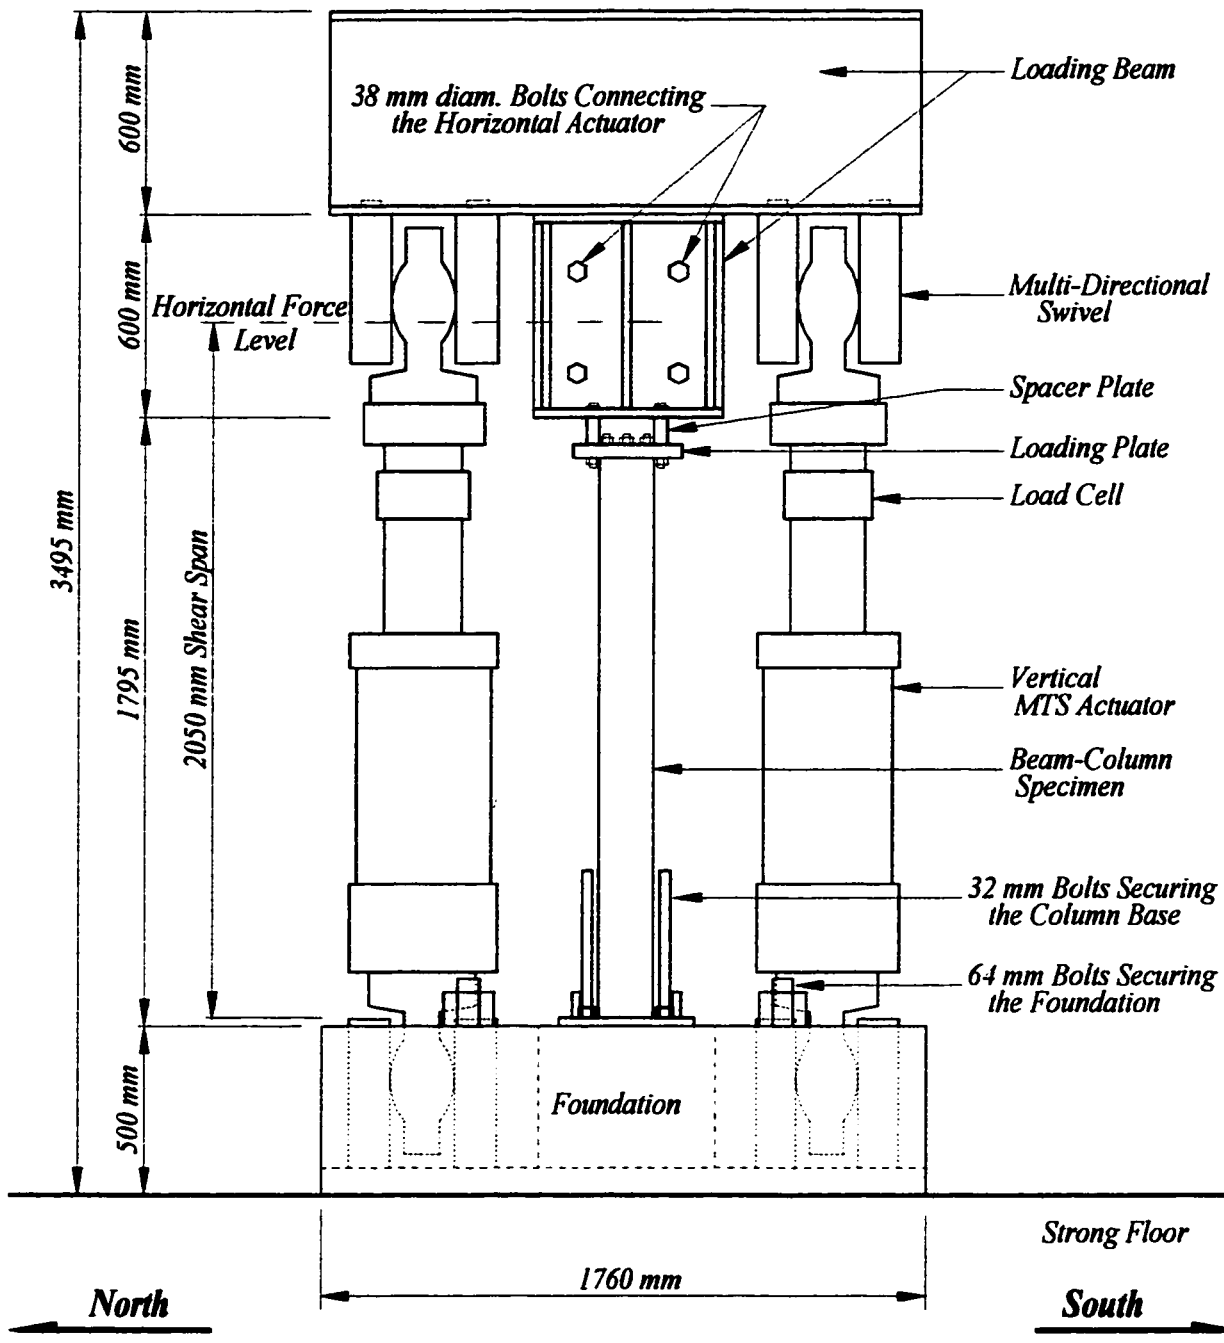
Test Setup for a Beam-Column Specimen Front View
